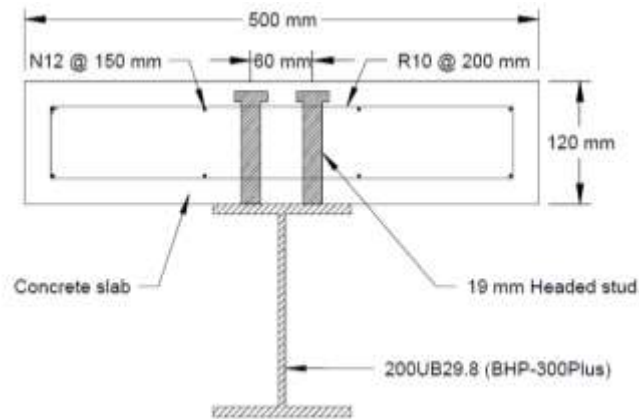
Cross-sectional views for CBF-1, CBF-2 and CBF-3
